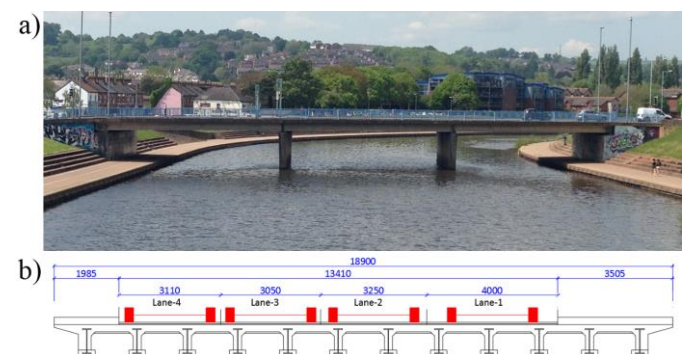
Exe North Bridge: (a) Elevation view, (b) sketch of deck cross-section.
